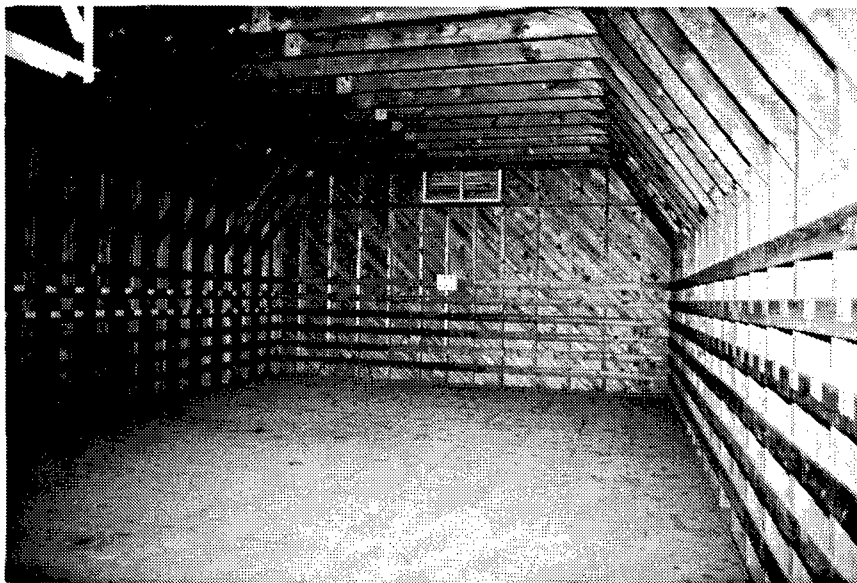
Building 119-H: Interior view of a Small Arms Pyro Magazine and Propellant Storage building.
